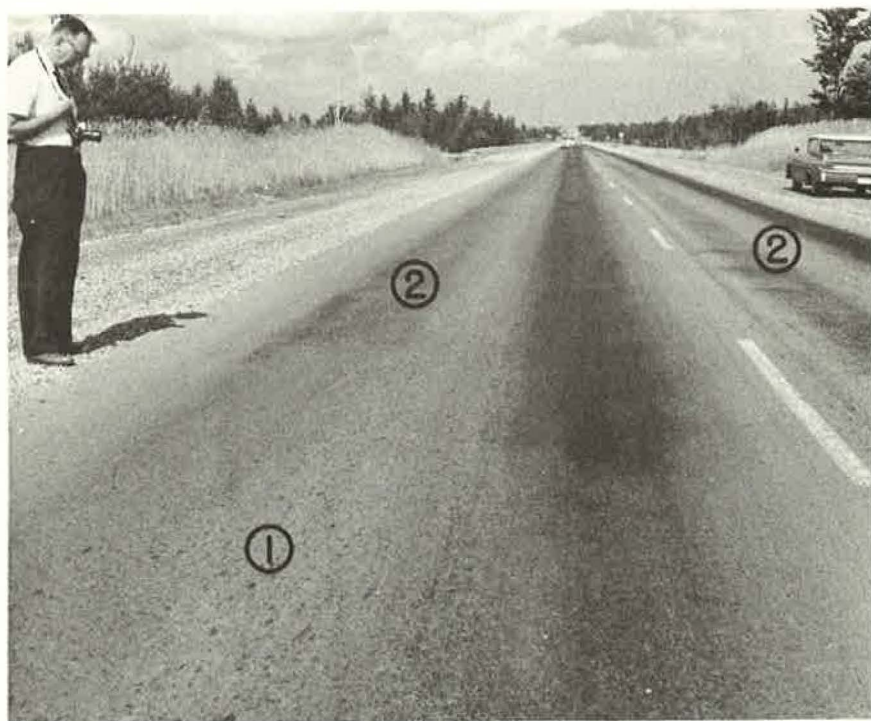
Serious flushing in wheelpaths in asphalt-concrete containing lower viscosity asphalt cement beyond junction with asphalt concrete containing higher viscosity asphalt (age 8 months).
